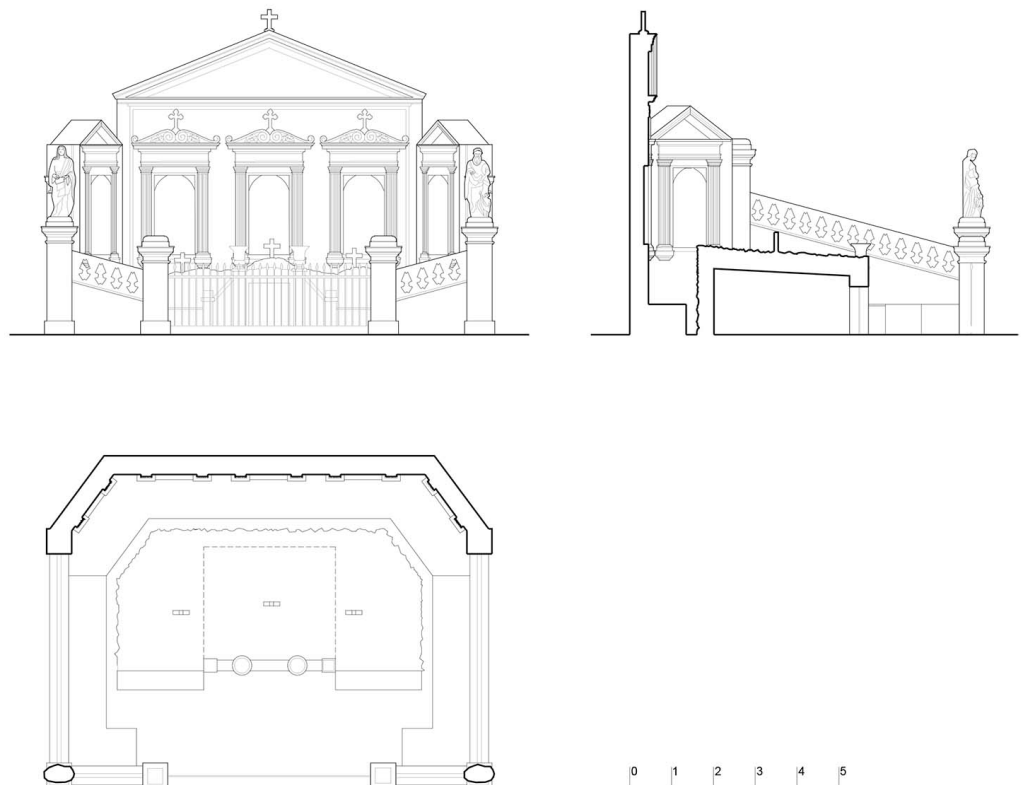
Calvario of Carovigno. Elevation, plan and section: L 10,65m x W 7,95m x H 7,79m.
